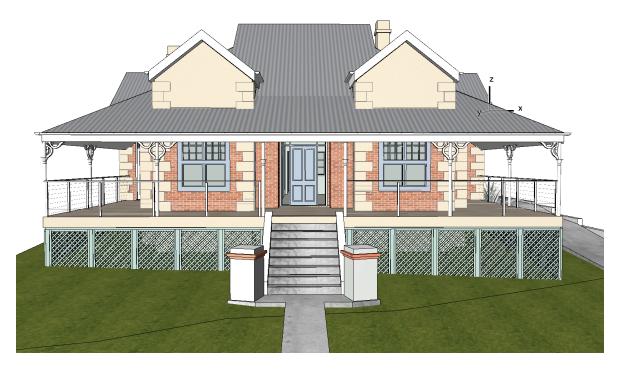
Facade of dwelling after proposed alterations and extension -no changes proposed to facade. (Source: Your Home Designs)
